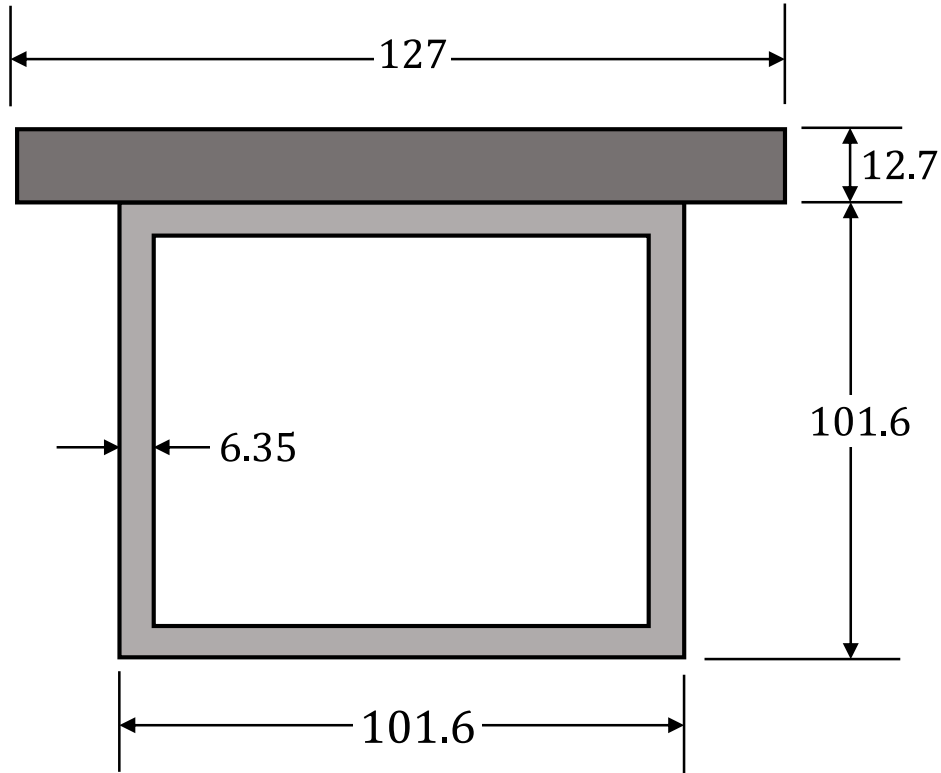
Column with attached faceplate dimensioned cross section (units in *mm*)
